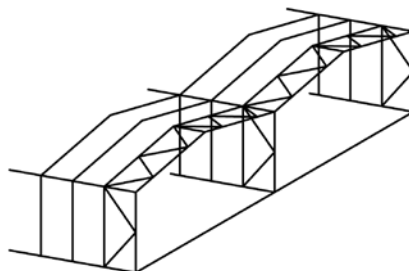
Vertical bracing in walls plus plan bracing in the roof.
